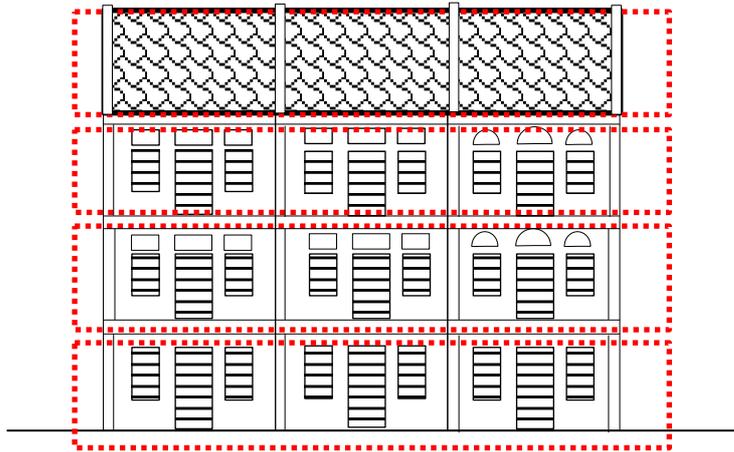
One of the buildings in Puerto Madero's riverside that has been revitalized to a new function as a commercial building
